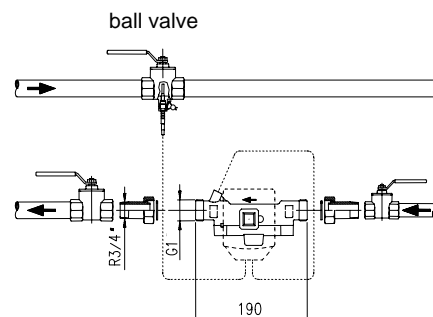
Example of mounting with ball valve and heat meter with 190 mm fitting
